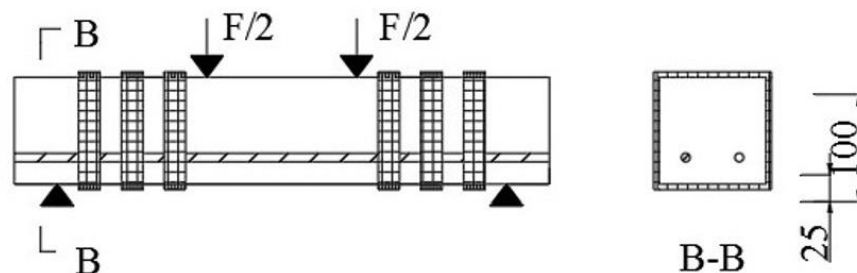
Geometric and reinforcement details of the beams reinforced with FRP
